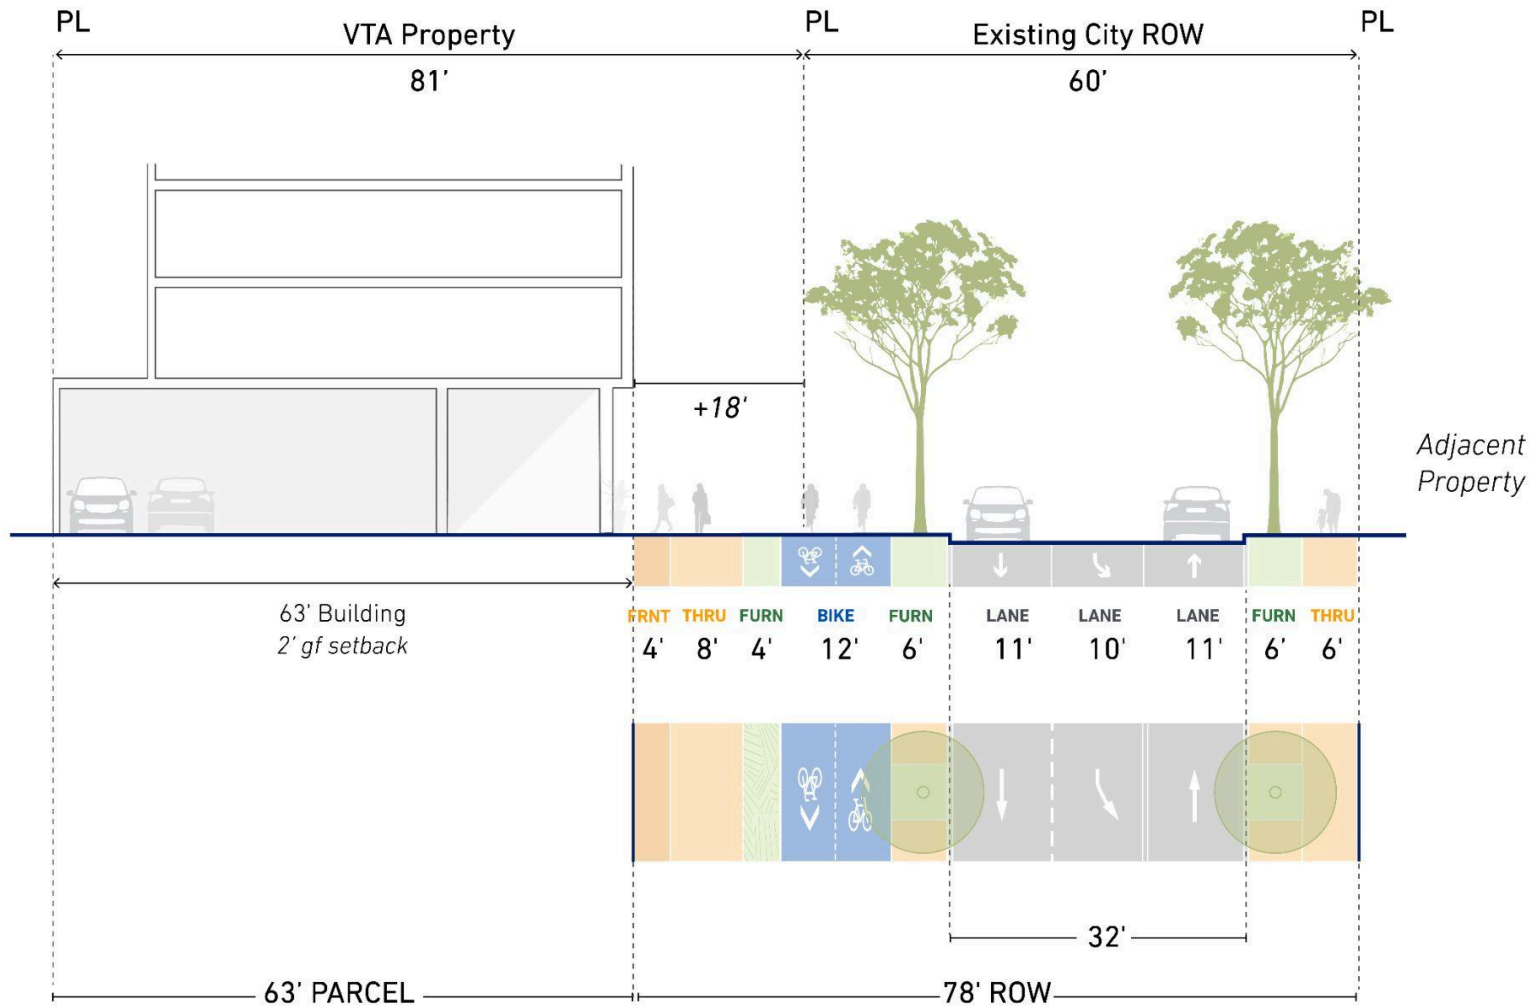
Conceptual N. 28th Street section #3 near E. Santa Clara Street with separated sidewalk and bikeway (section 3)
